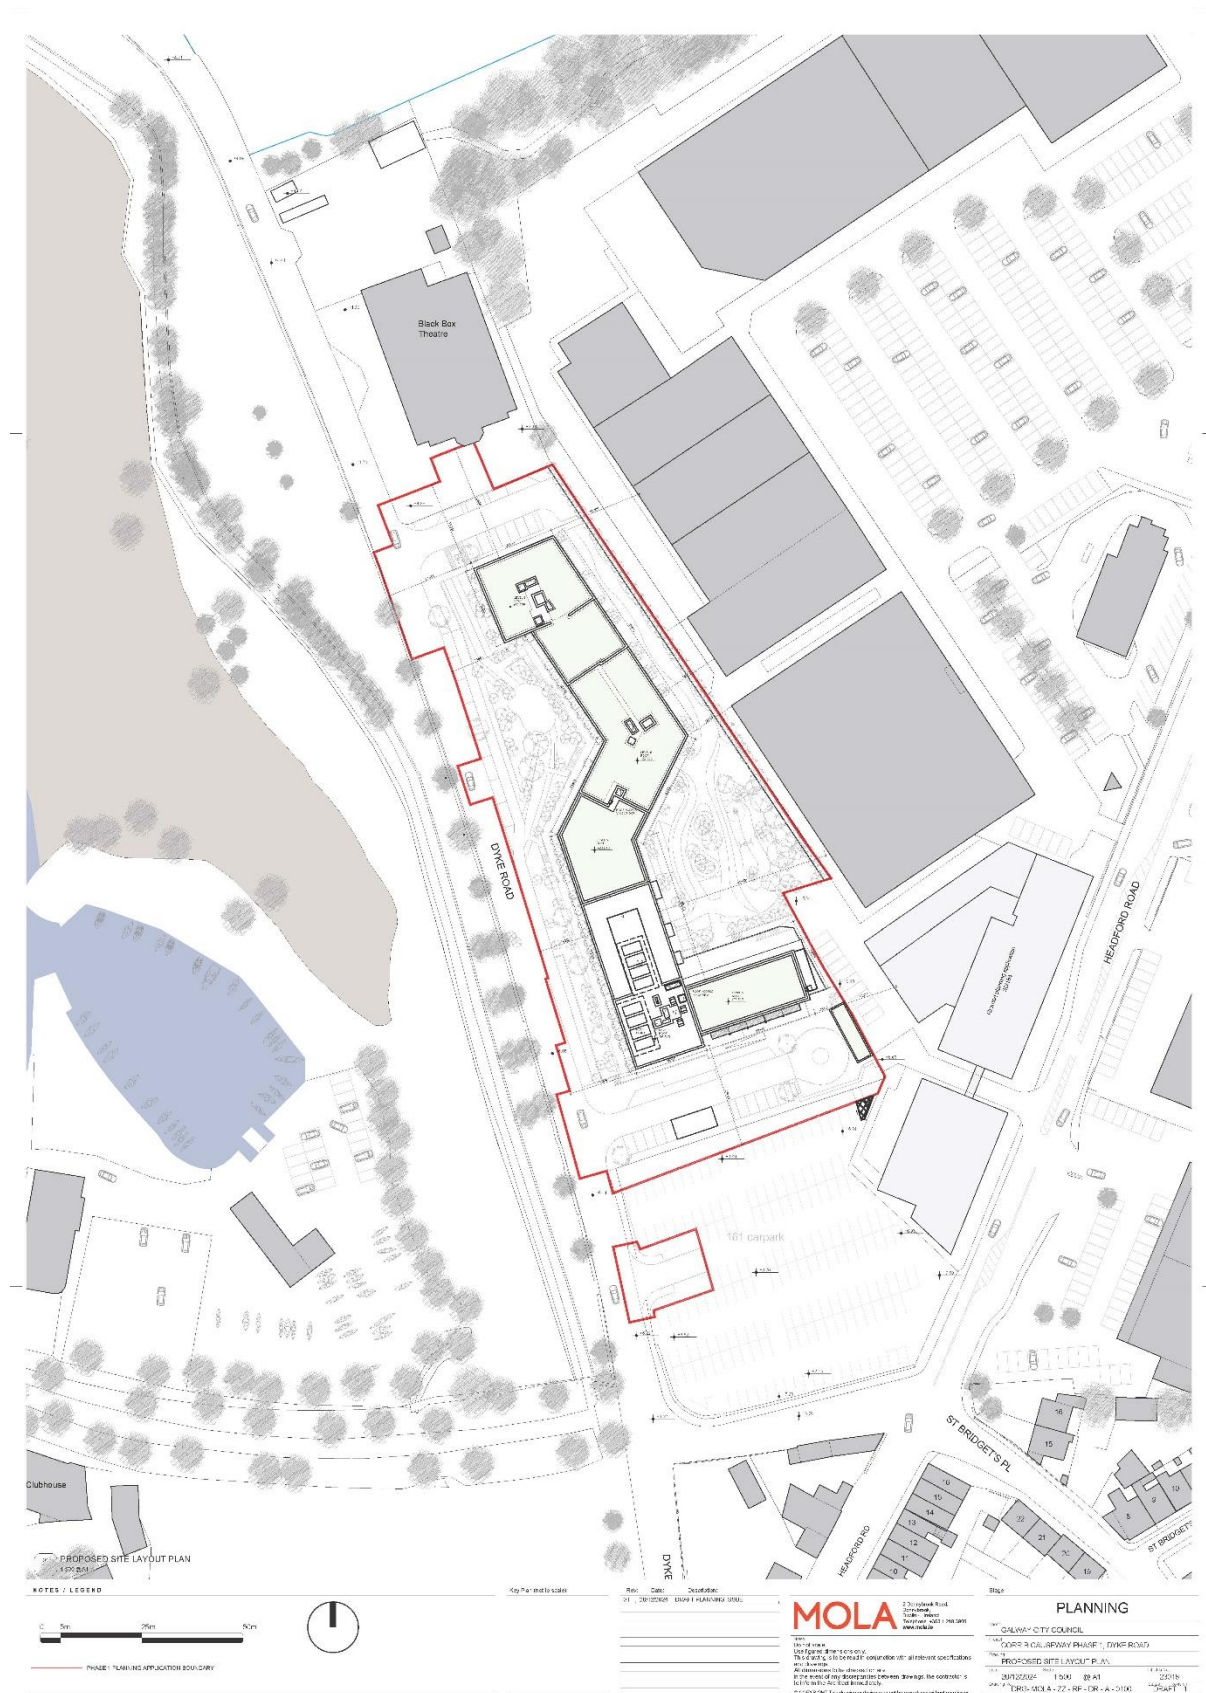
Proposed Site Layout (Drawing no. DRG- MOLA - ZZ - RF - DR - A - 0100, MOLA, 2024)
